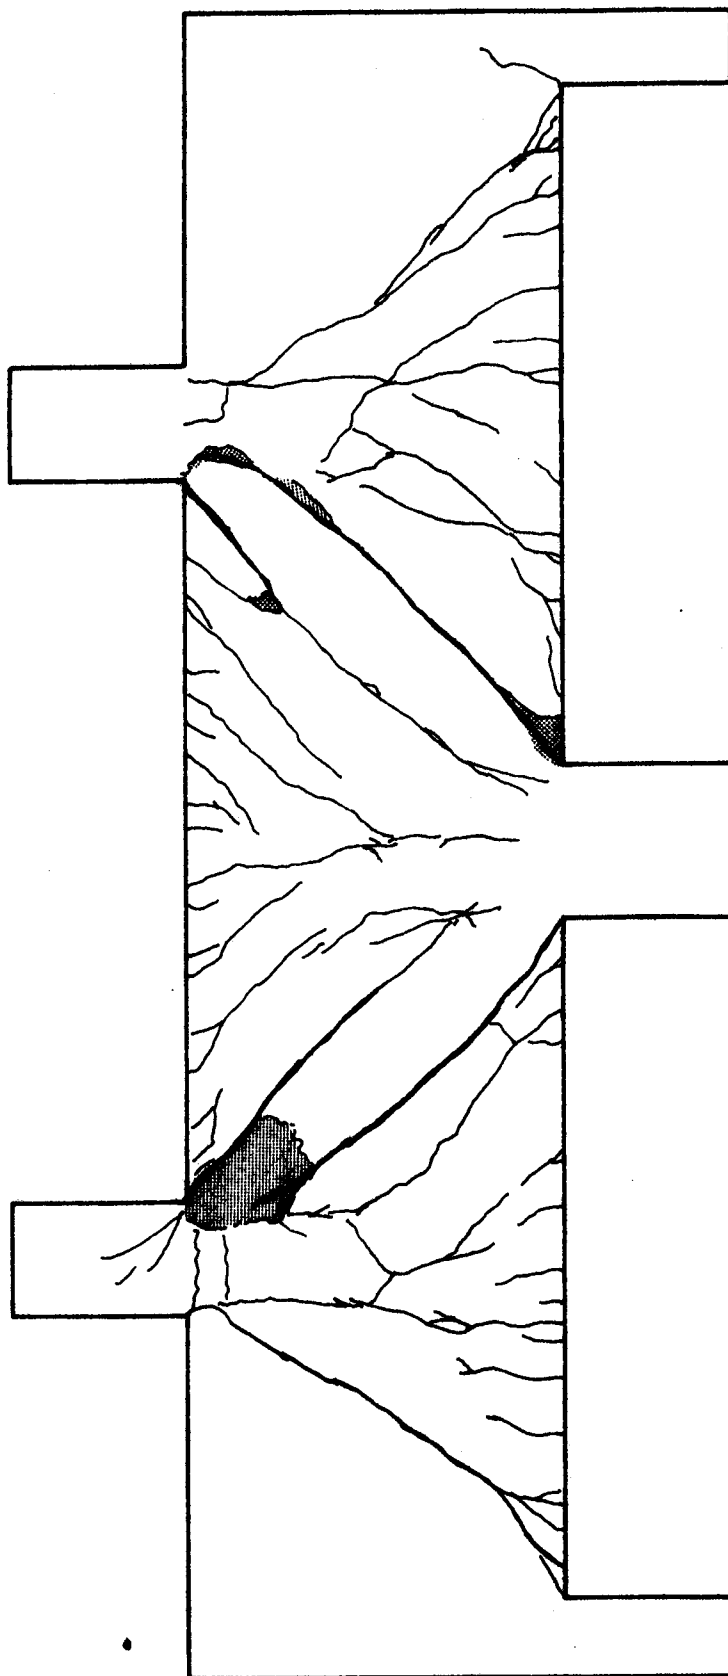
Beam 4/1.0 Crack Pattern - East Face (Reversed)
